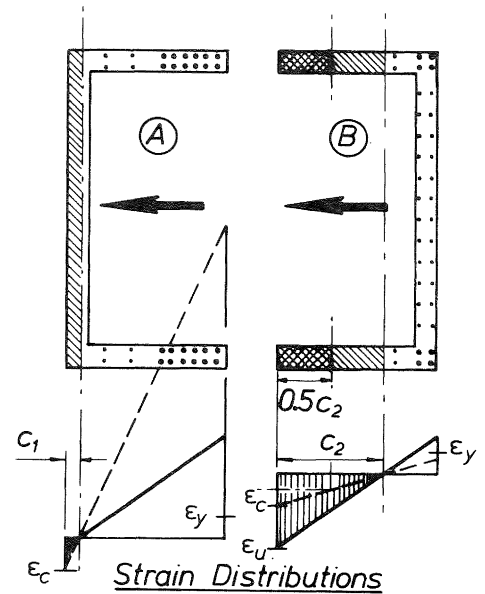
Strain Profiles for Channel Shaped Wall Sections.
